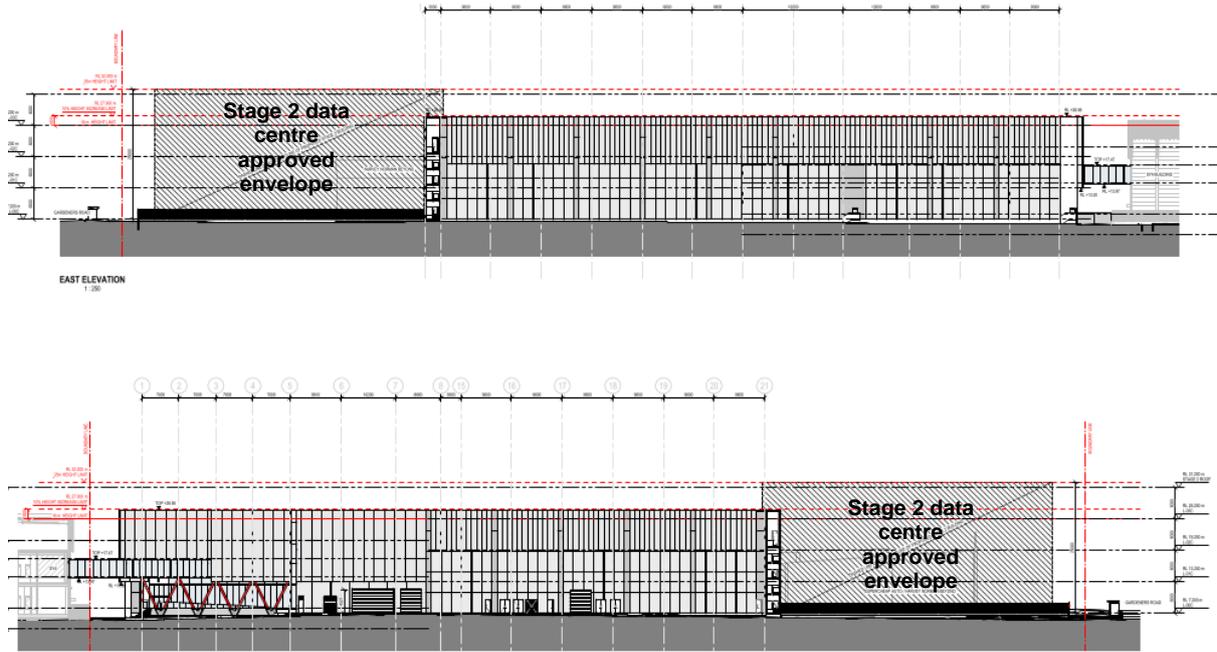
East and west elevation showing approved envelope of the subject stage 2 data centre
